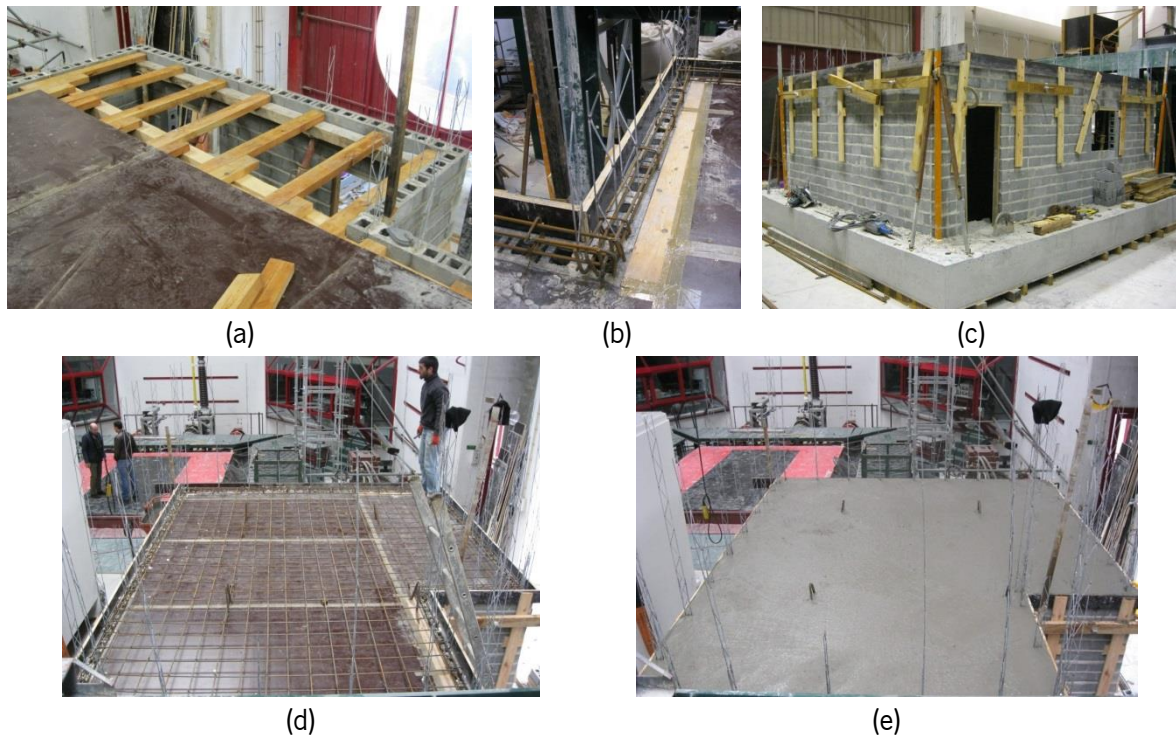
Construction of slab: (a) wood scaffold and smooth board formwork, (b) perimeter supporting beams, (c) first masonry story with slab's formwork, (d) view before casting and (d) view of slab after concrete pouring and smoothing
